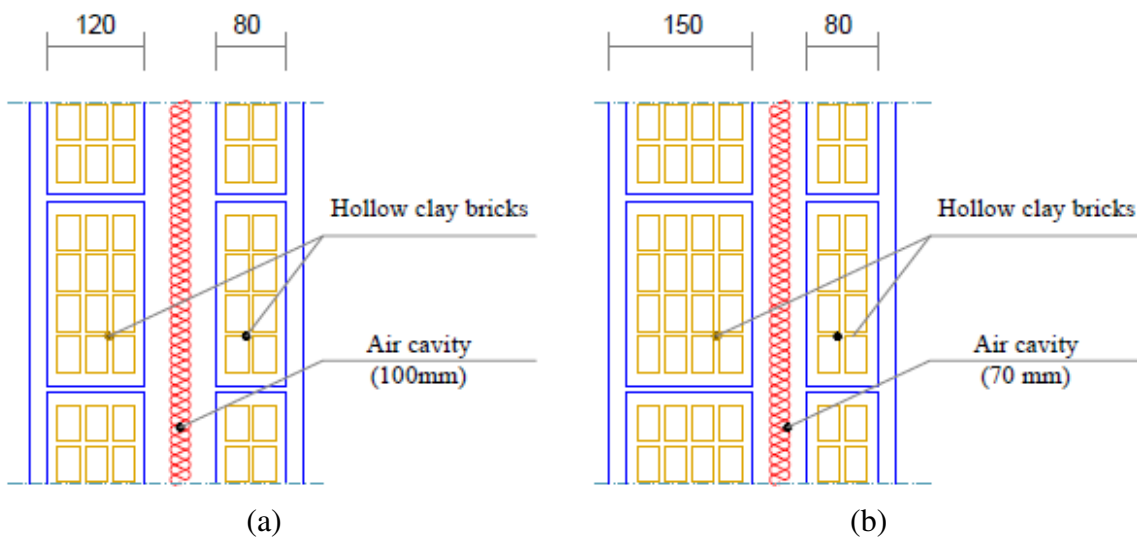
Masonry infills typology for or the 1950s-60s and 70s buildings (a) and 1980s-90s buildings (b)
